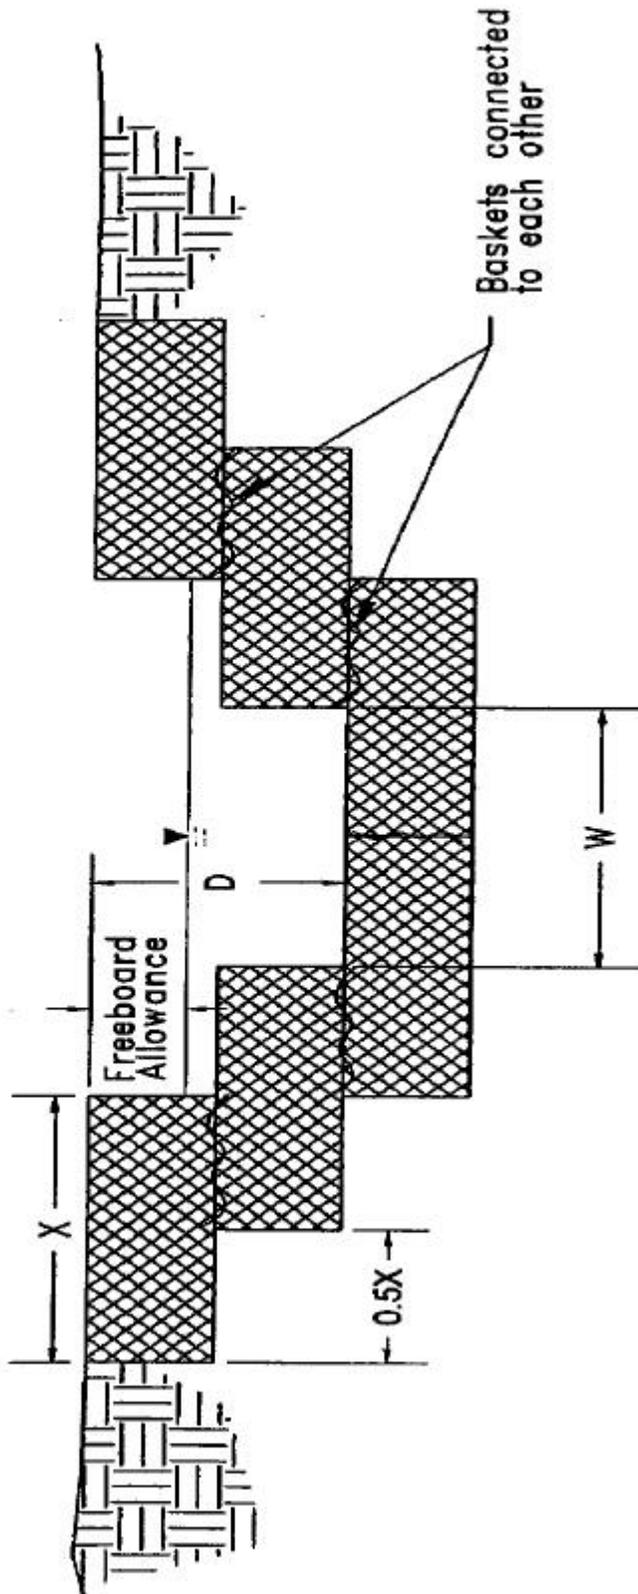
Typical Cross Section for Rock Gabion Drop Structure
